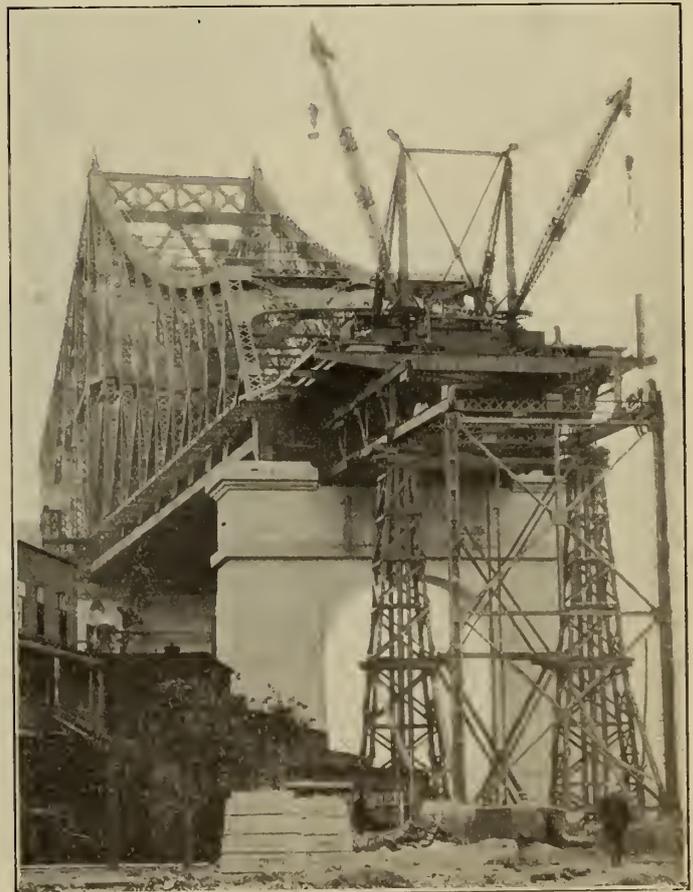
North Approach—Typical Method of Erection—Second Stage.
